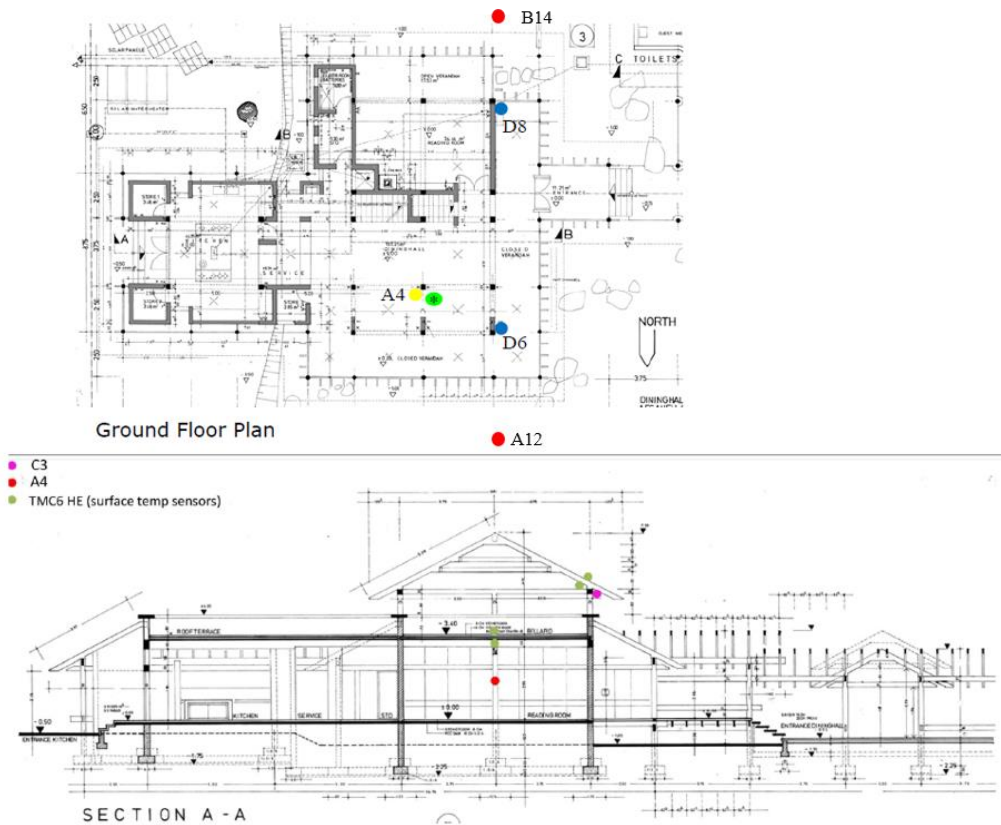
Afsanah – Floor plan and section through the entrance and dining hall indicating the logger locations
